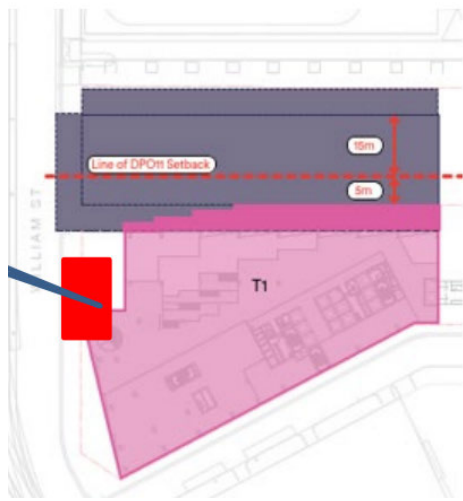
Left: Tower One typical floor plan. The red square indicates area where additional built form would be located should the cantilever not be approved. (Source: Lendlease (undated) Queen Victoria Market – Southern Development Site Project Feasibility – Tower 1 and Tower 2)
